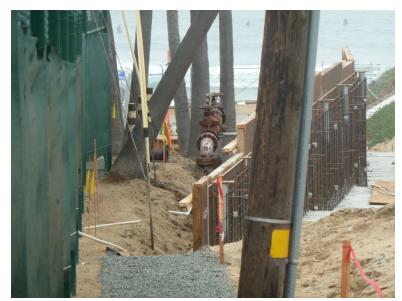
View of concrete retaining wall under construction on July 11, 2012. The existing palm trees and backflow preventer can be seen in this view.
